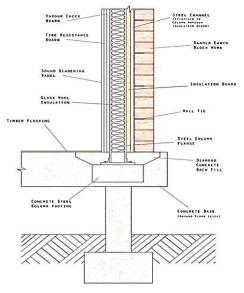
Rammed Earth wall Section https://architechandenvironment.weebly.com/theproject/rammed-earth-blockwork
